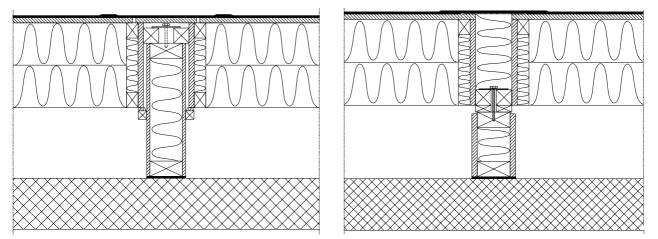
Supporting wooden beams at the top or at the bottom of a roofing cassette
